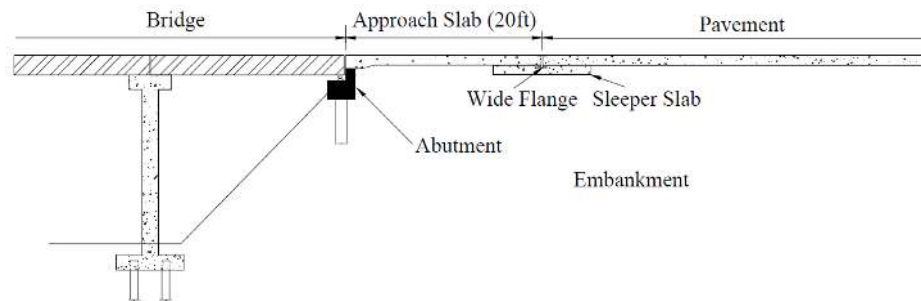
Single span approach slab (Seo, Ha and Briaud 2002)
